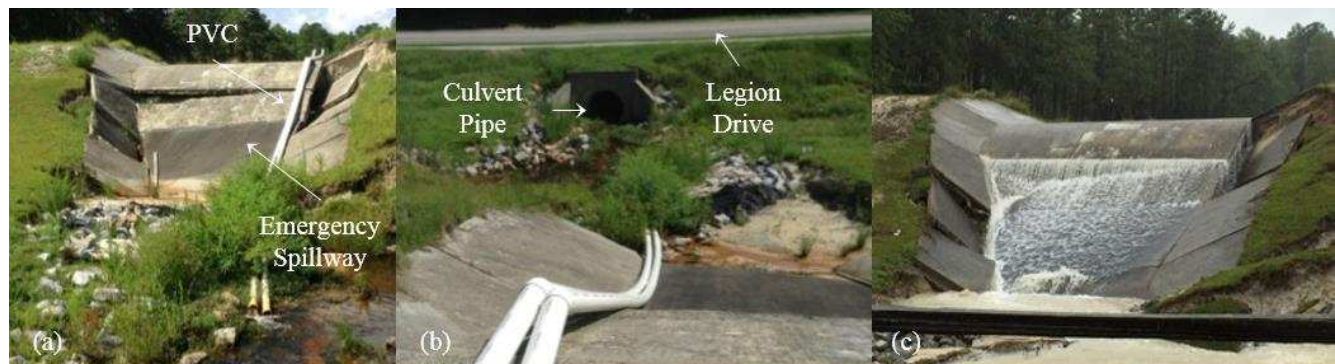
Emergency spillway and PVC drainage pipes at Dam D a) southwest view from downstream; (b) culvert pipe below the two-lane road (northeast view from the crest); and (c) failed concrete spillway during the heavy rain event (southwest view from downstream).
